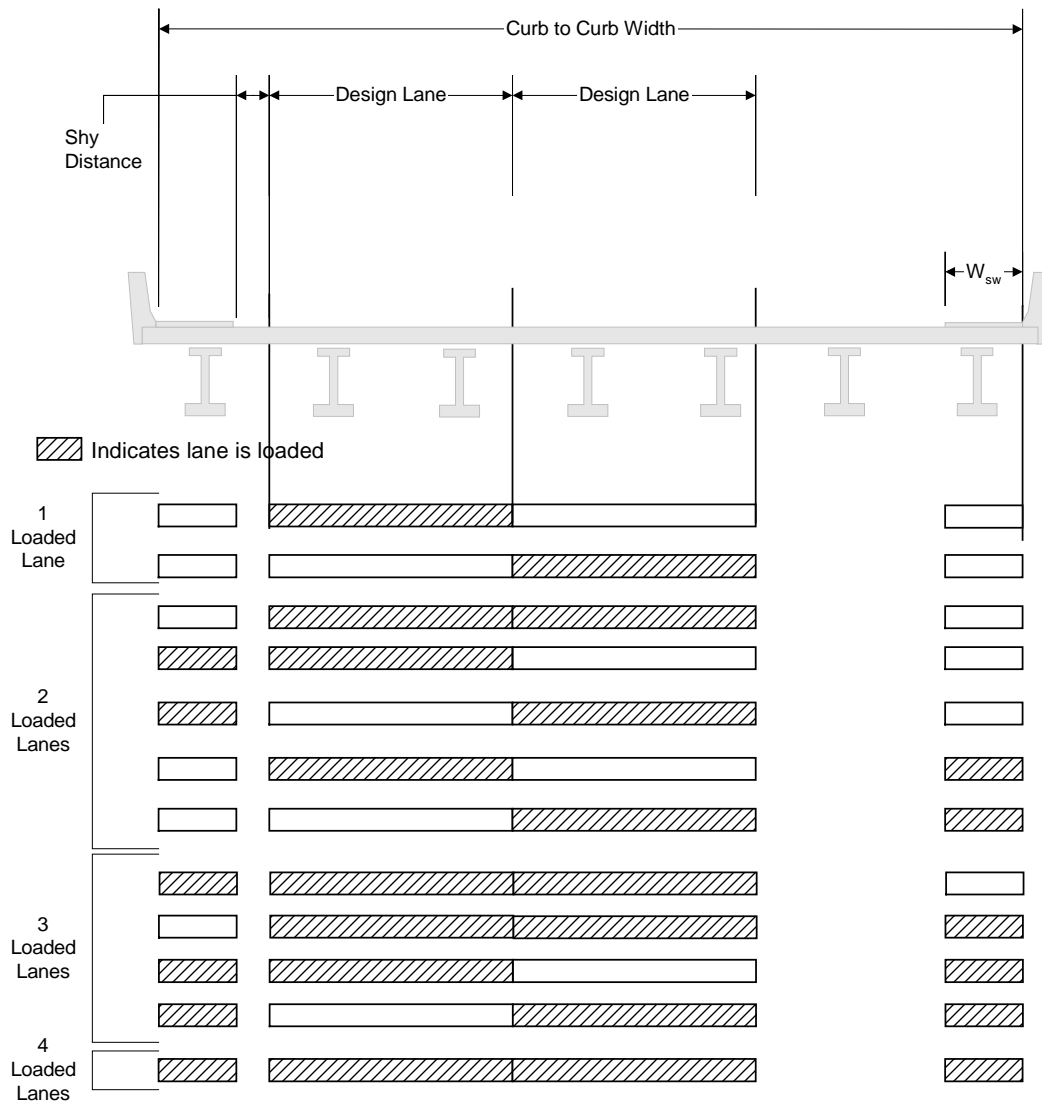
Permutations of Loaded Design Lanes for a 3 Lane Structure with two Sidewalks
